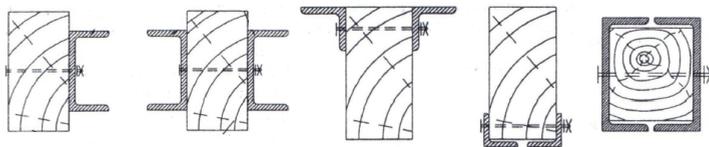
Strengthening of wooden beams using steel profiles [4]
